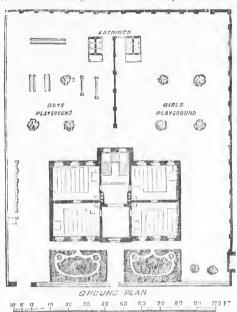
Glock Plan of School Hotel and Grounds. No. 0
